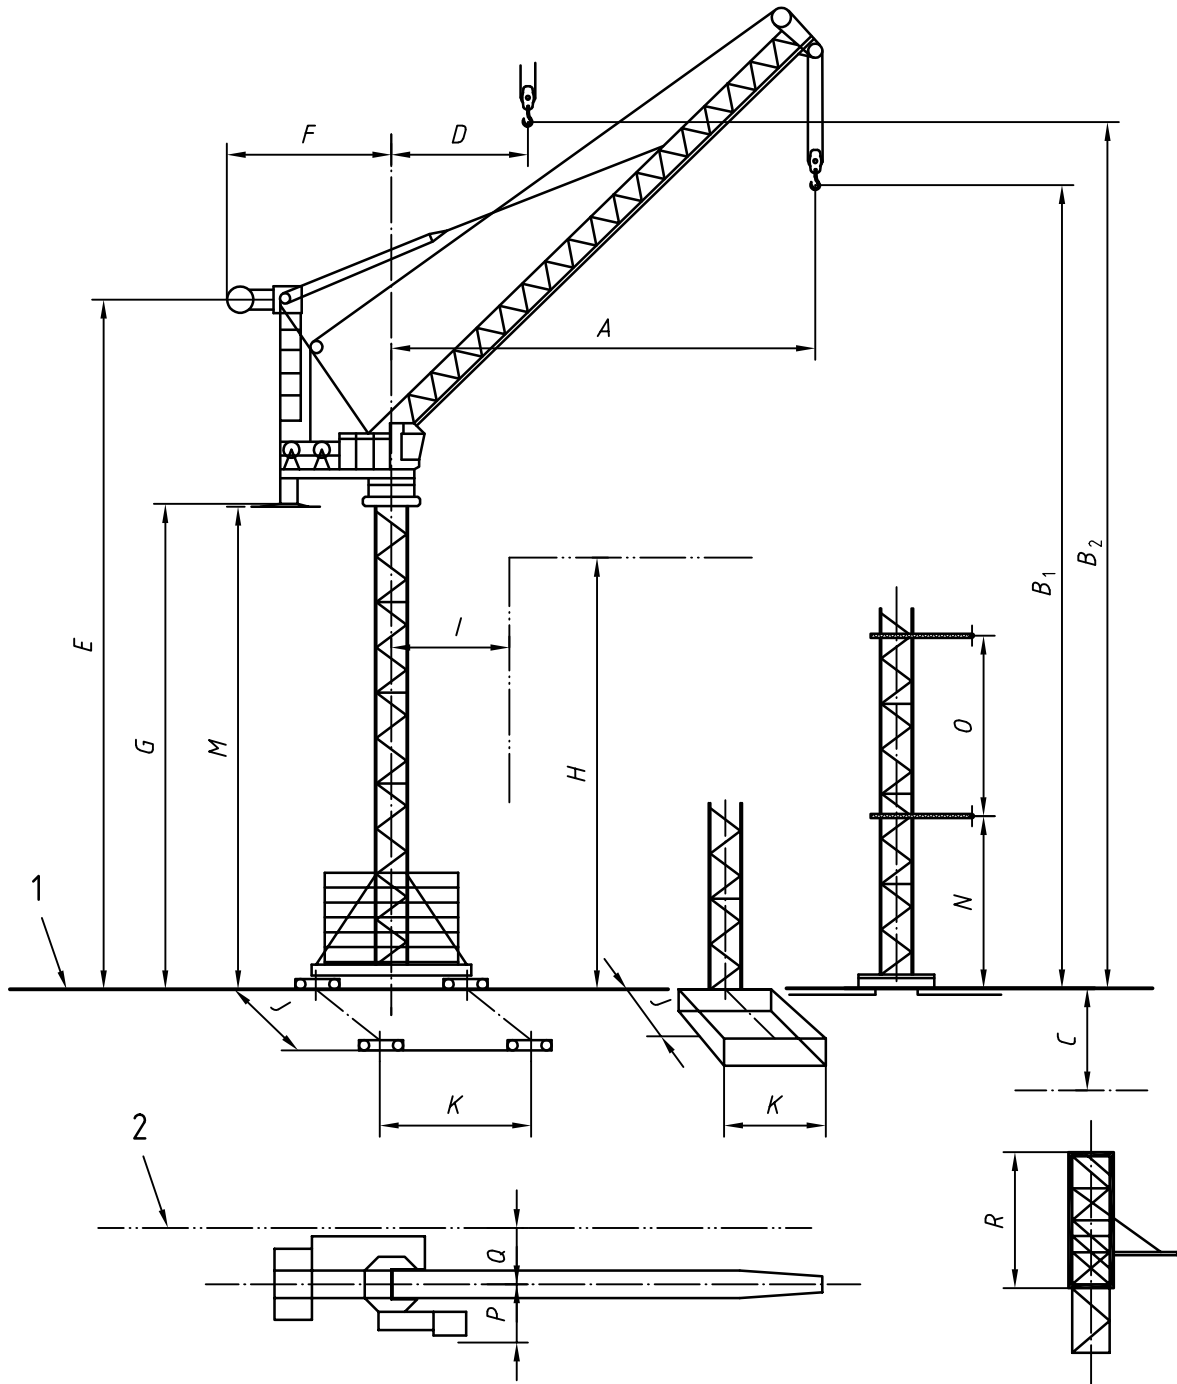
Examples of dimensions to be provided by the manufacturer, as applicable (continued)
